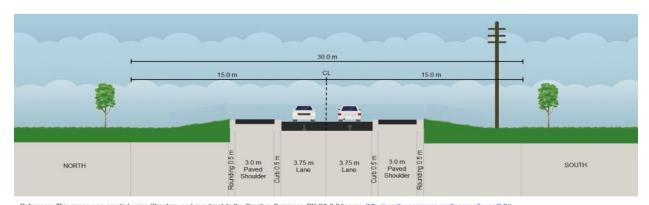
Sub-Section 2-9 - Modified Cross Section
